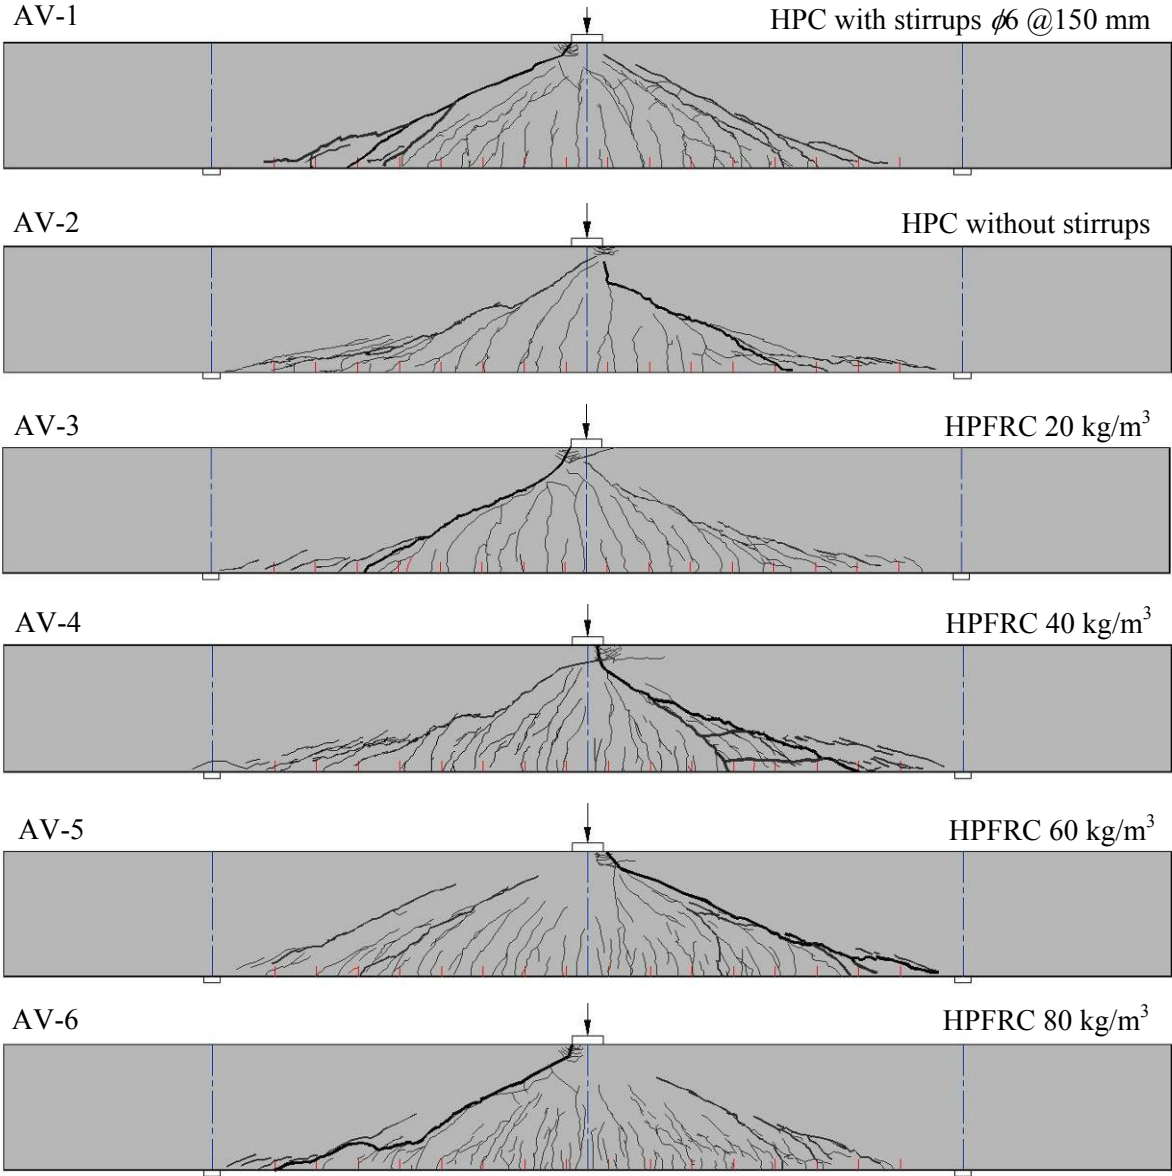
Cracking pattern of the shear beams AV-1 to AV-6
